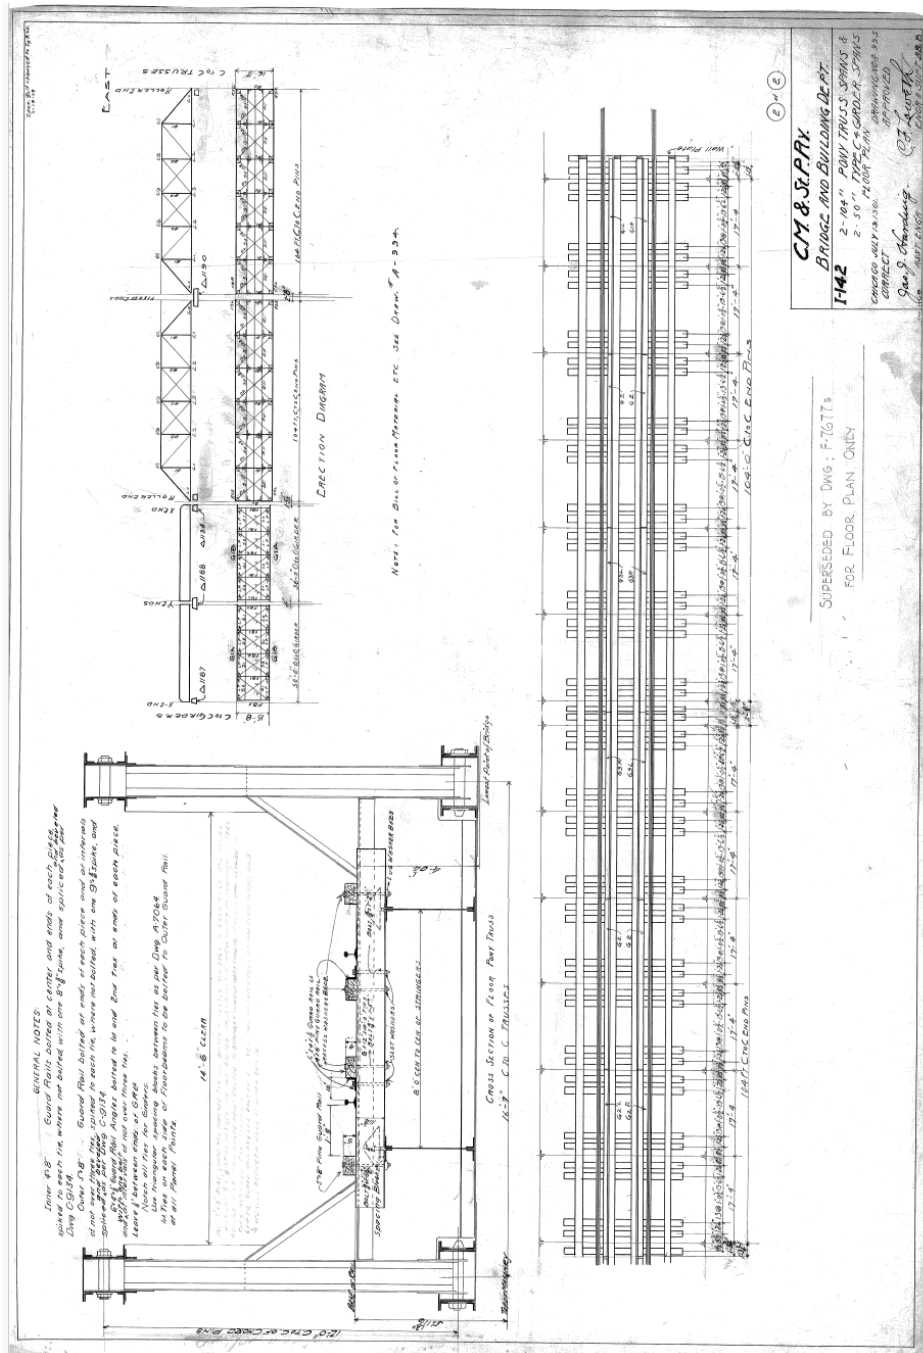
Copy of an original Bridge I-142 engineering construction plan. (Chicago, Milwaukee, and St. Paul Railway, Bridge and Building Department. *I-142 2-104 ft Pony Truss Spans & 2-50 ft Type C4 Girder Spans, Floor Plan, Drawing no. A-995, Chicago, July 19, 1901. 2 of 2.* Electronic copy provided by SW Bridge Engineers, LLC, De Forest, Wisconsin, May 2023.)
